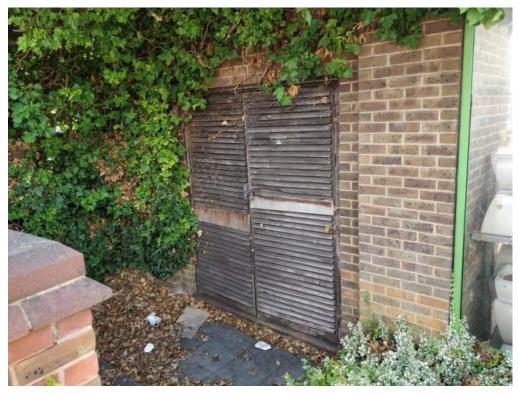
Brick structure assumed to be occupied by Southern Gas Network
